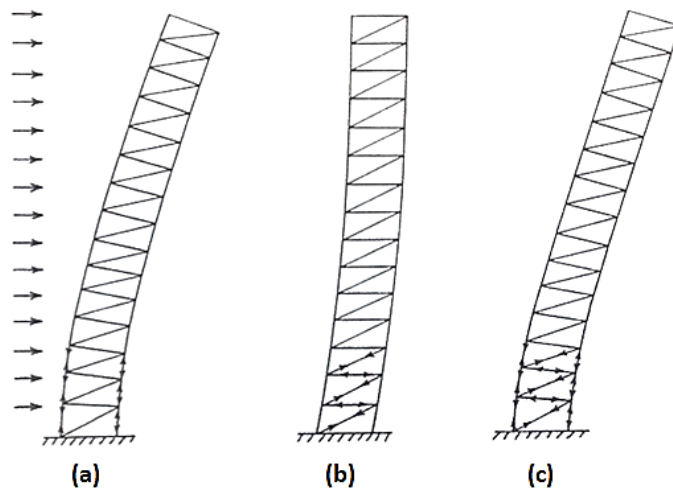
Different structural behaviour of a bracing truss unit subjected to lateral load; (a) Flexural deformation; (b) Shear deformation; (c) Combined flexural and shear deformation. [Smith and Coull (1991)]
